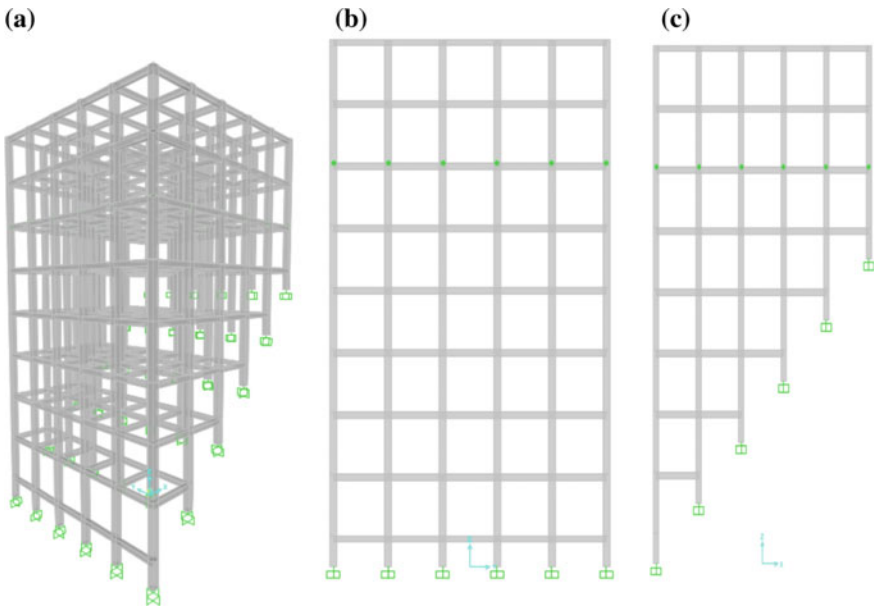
Numerical model of (a) sample G+3 building model on 45° slope (b) elevation along valley direction (c) elevation along ridge direction
